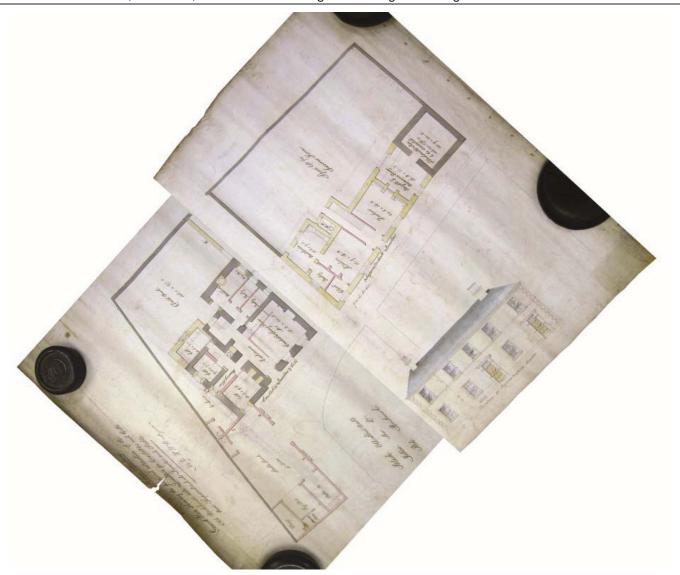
Undated ground floor plans of proposed alterations to 'Old Workhouse' (CAC(B) BDKF Plans/4 nd)
